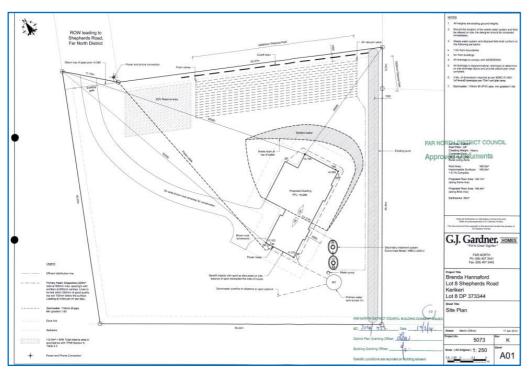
BC-2014-723-0 Approved Plan showing wastewater disposal system
